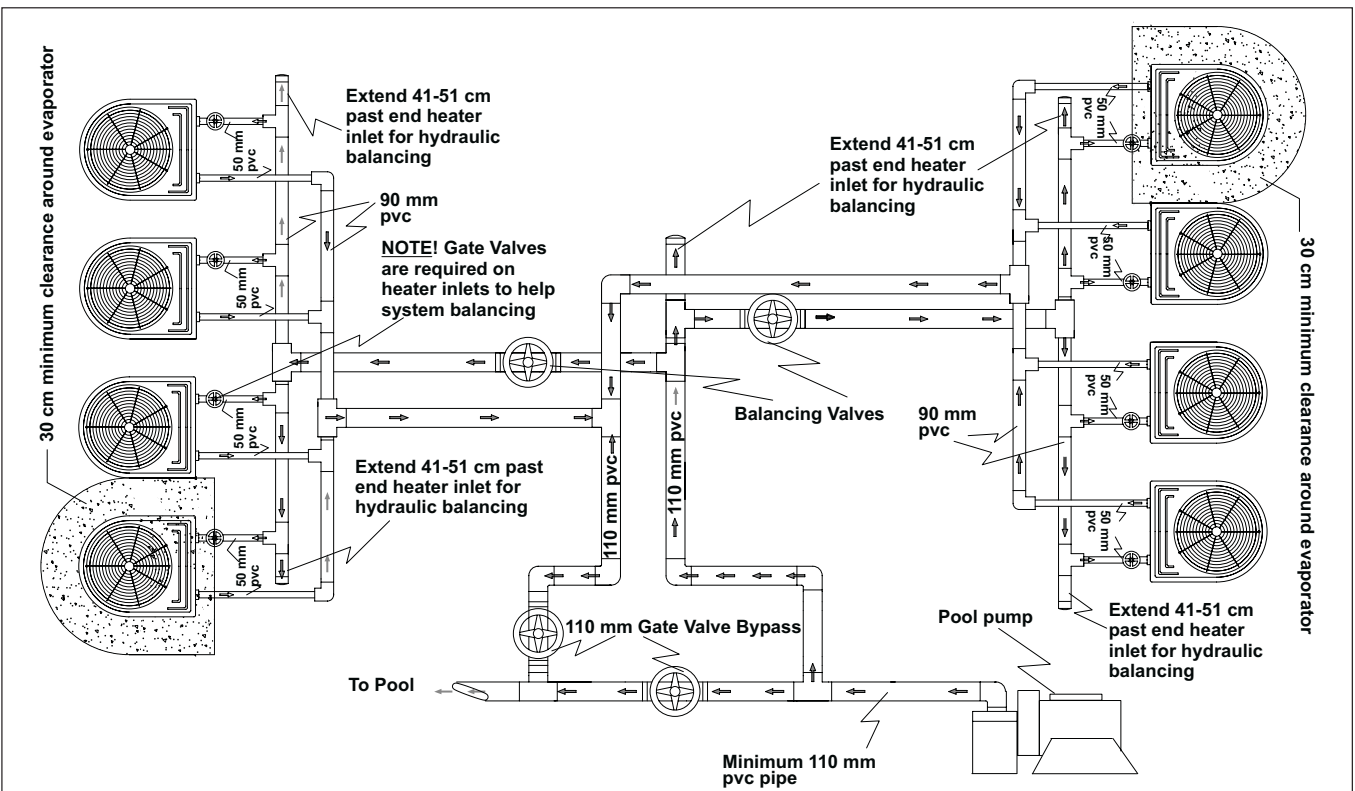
Eight Heat Pump Plumbing Layout (Dual Headers)
